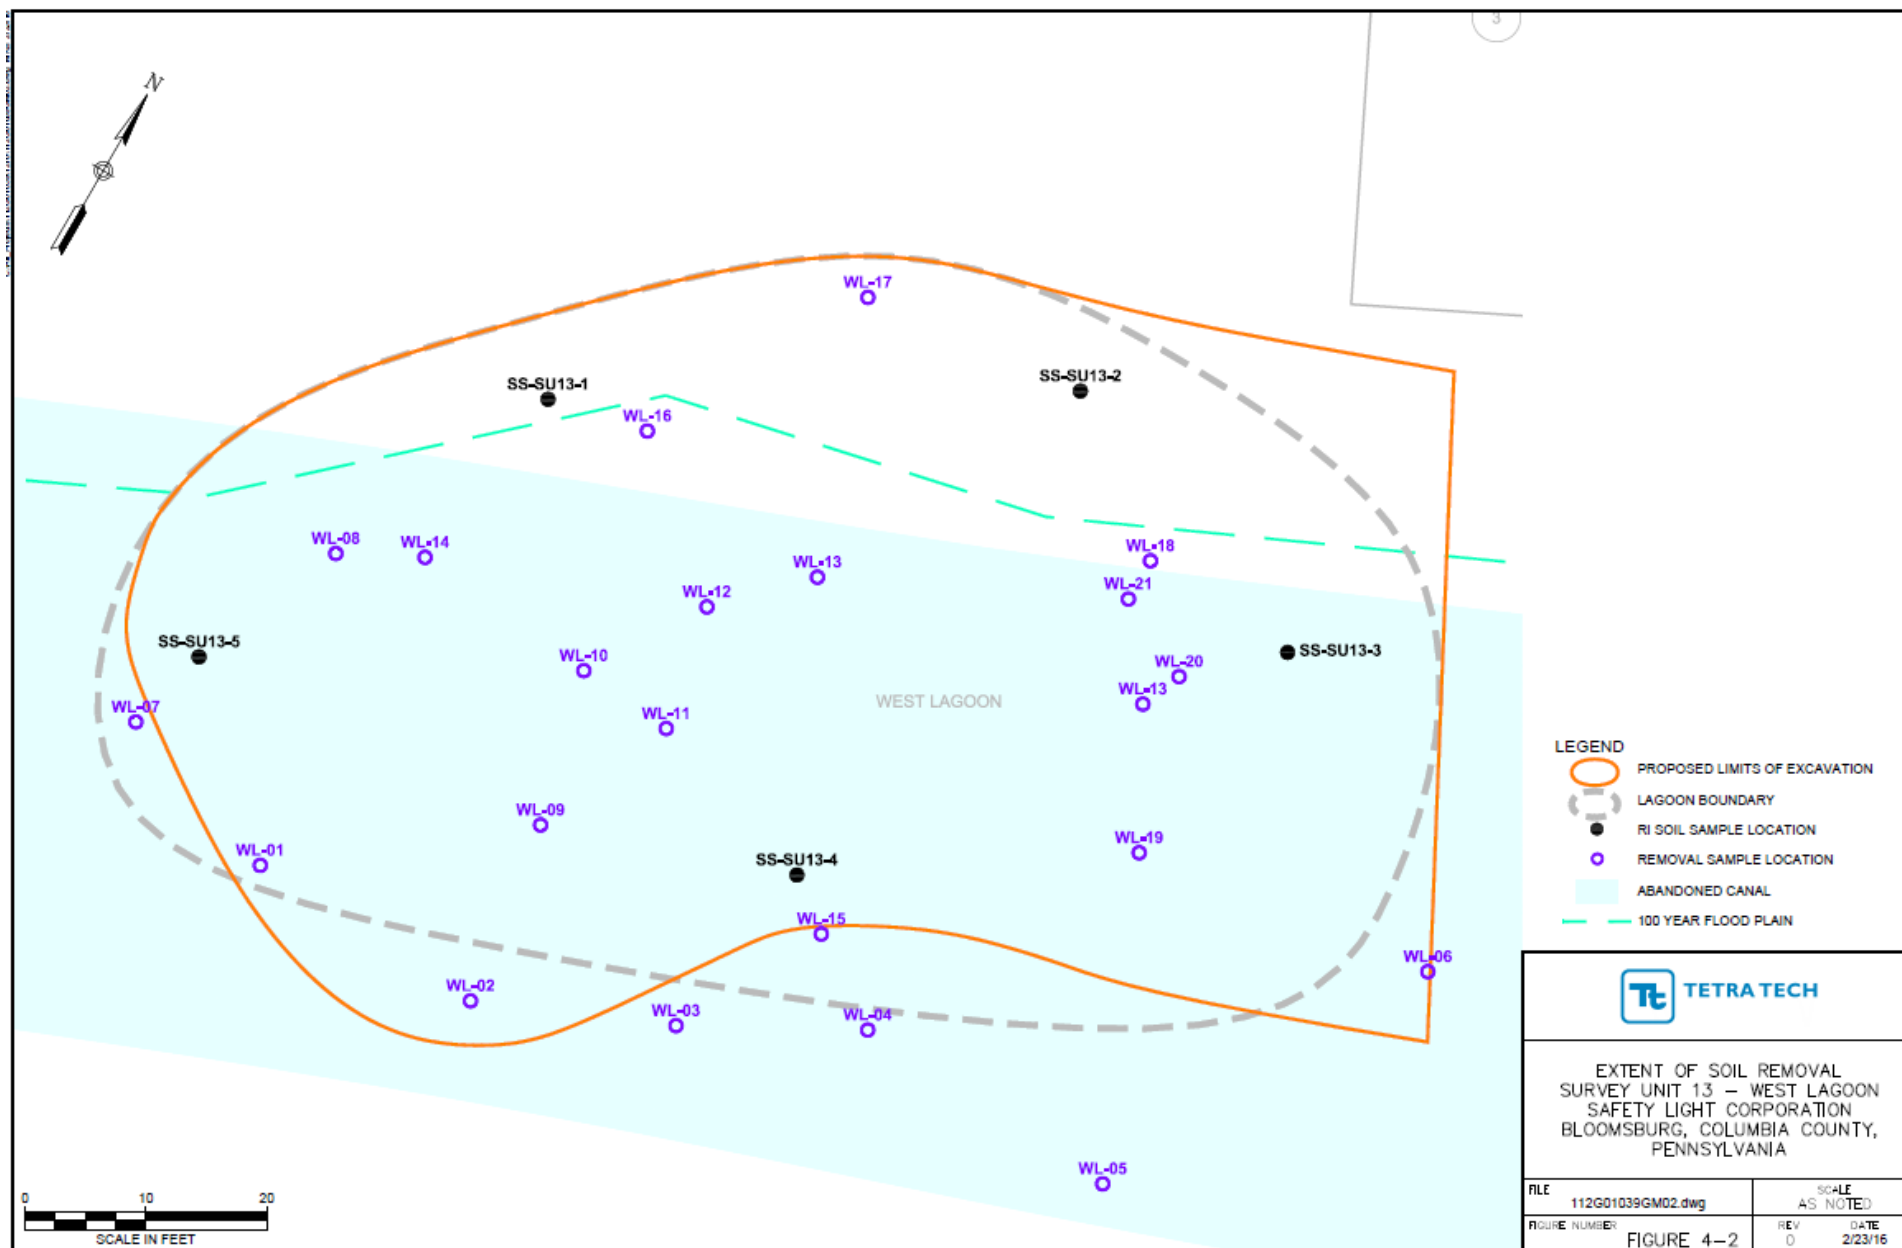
WEST LAGOON SOIL SAMPLE LOCATIONS/APPROXIMATE EXCAVATION LIMITS
